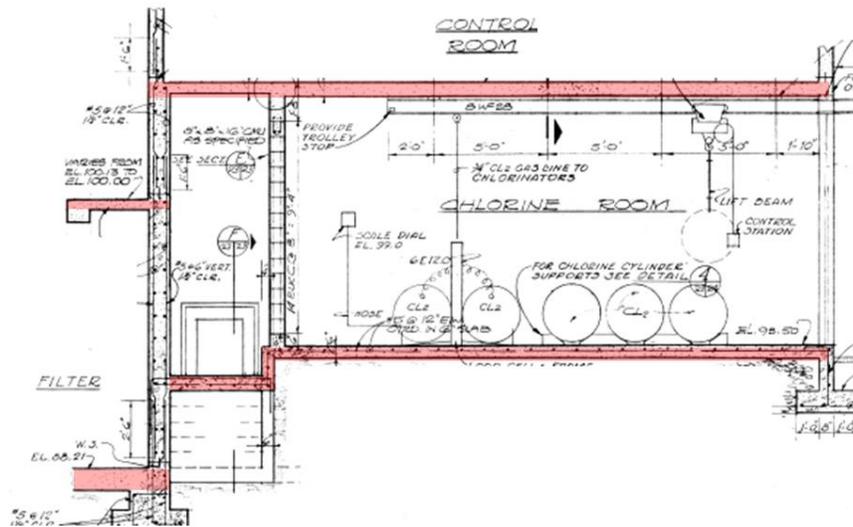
Control/Treatment Building (1970) and Filter Floor/Roof Levels not Aligned (Source Drawings: “Water Treatment Plant (A700004)”)
